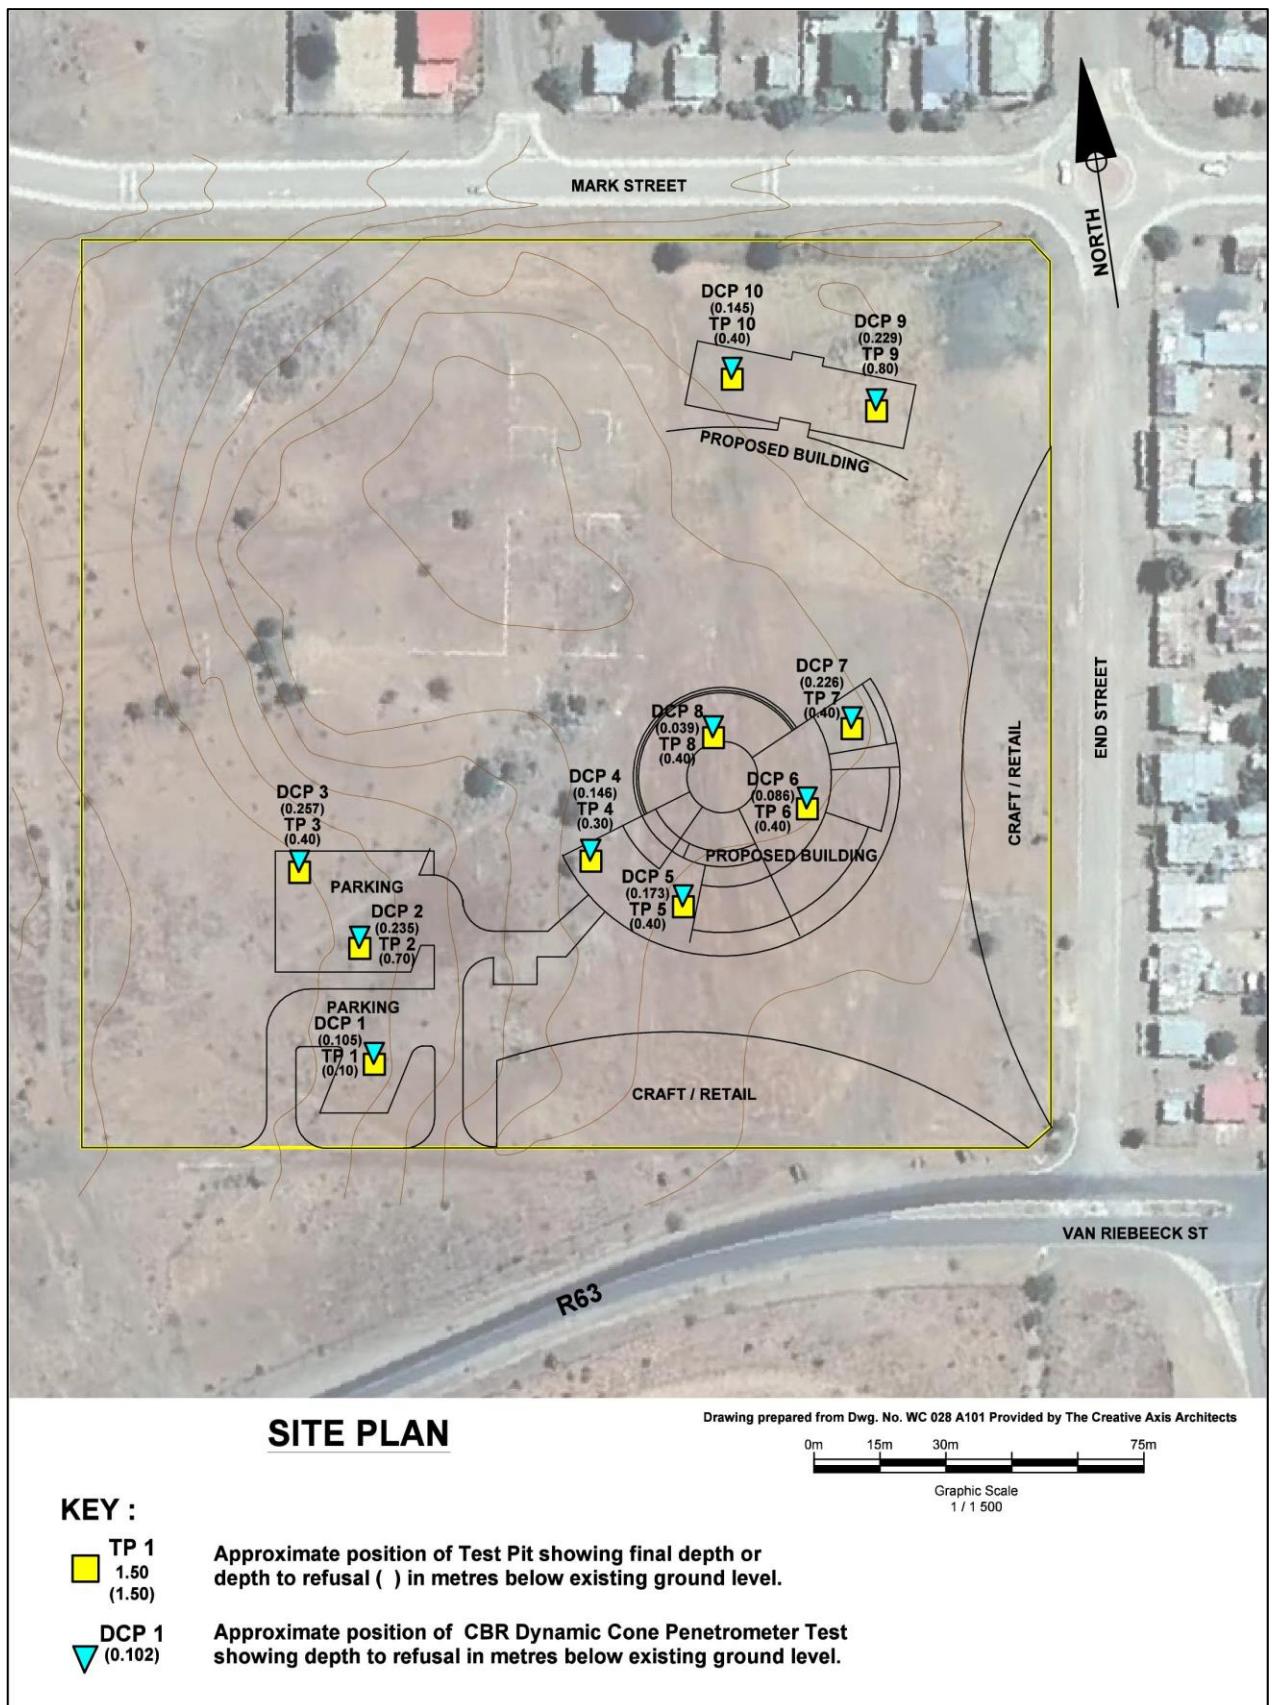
Site Plan showing positions of new buildings and geotechnical tests carried out
